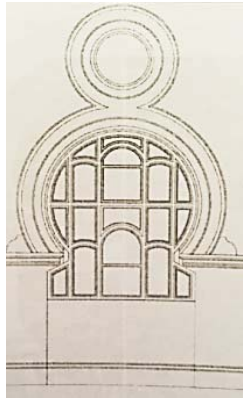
The horseshoe shaped window at Kuala Lumpur Railway Station
